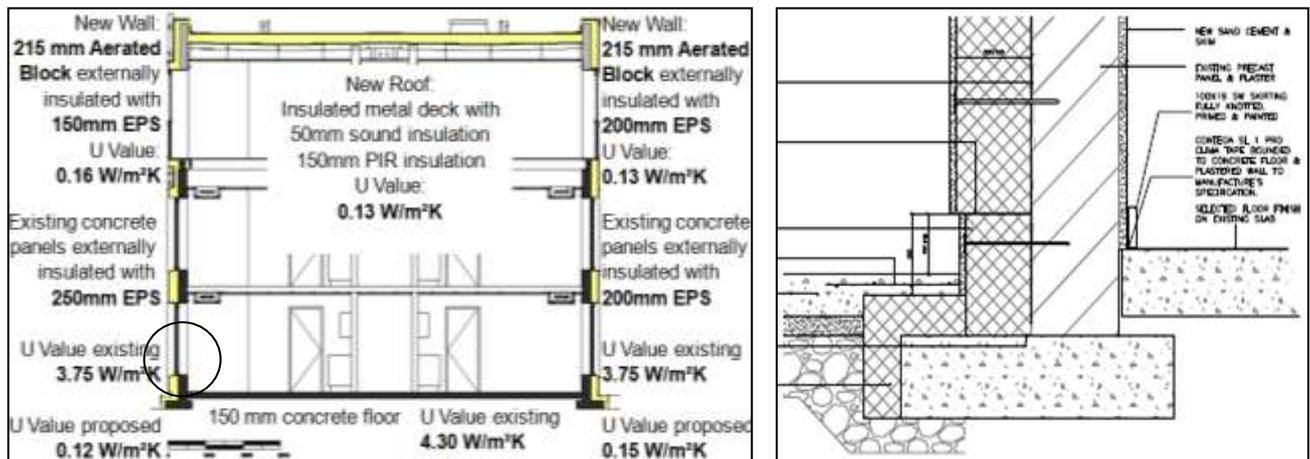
Left: Typical section showing two lower existing floors with new second floor above and the proposed external insulation on existing walls and new walls, indicating U-values of existing and proposed EnerPHit development (MosArt 2015) (not to scale). Right: Existing foundation detail showing the proposed external insulation on existing external walls down to the foundation and wrapping down to the edge of the foundation foot (Source: DLR Co. Co.) (not to scale)
